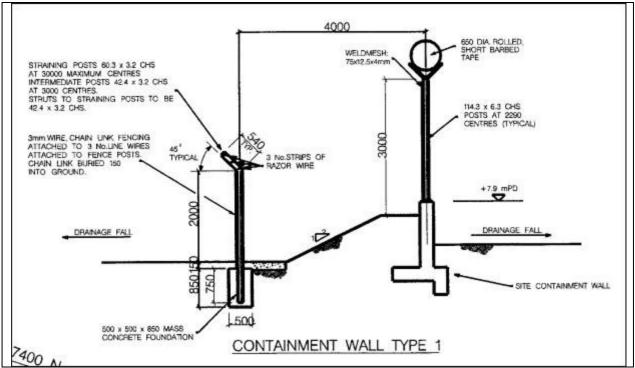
shows a typical cross section of the bund arrangement < Annex G-2 – EIA Report for Tung Chung - Ngong Ping Cable Car Project>
